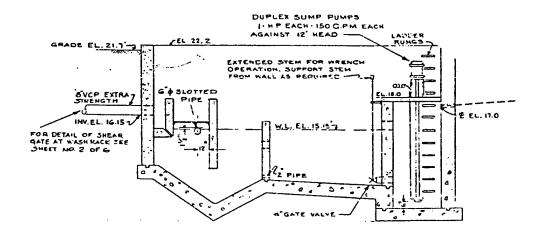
Elevation View of the Building 583 O/W Separator.
